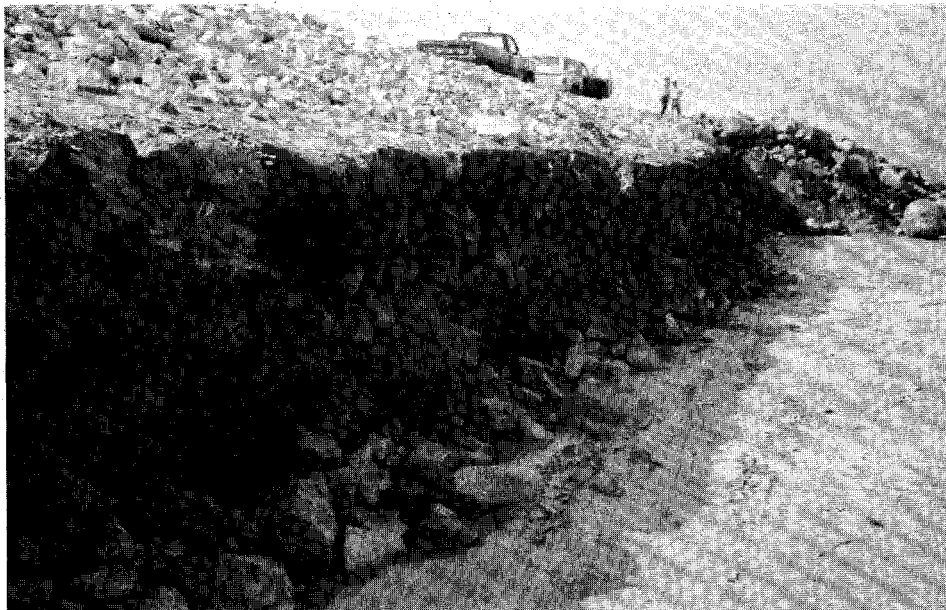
Bautista Creek levee with flood fight embankment in the background.
